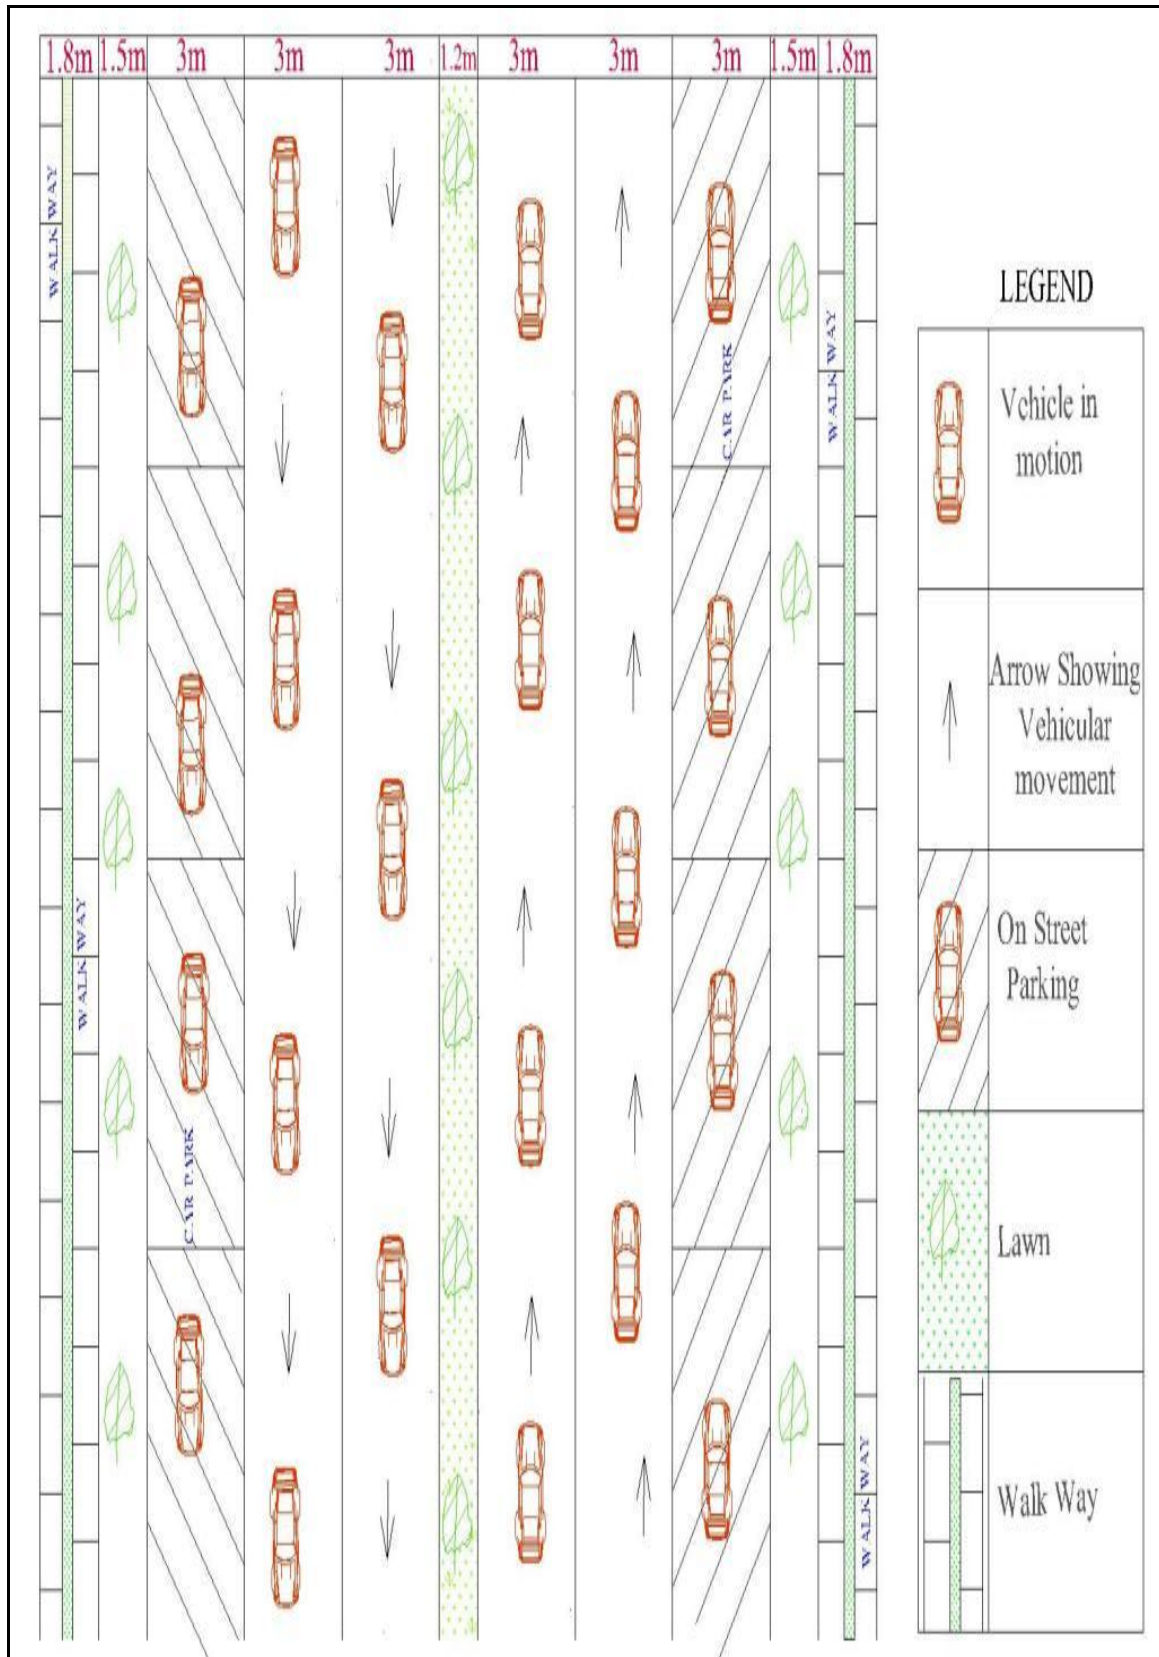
Horizontal cross section of Wuse II access showing on-street parking: Source; Field survey 2015
